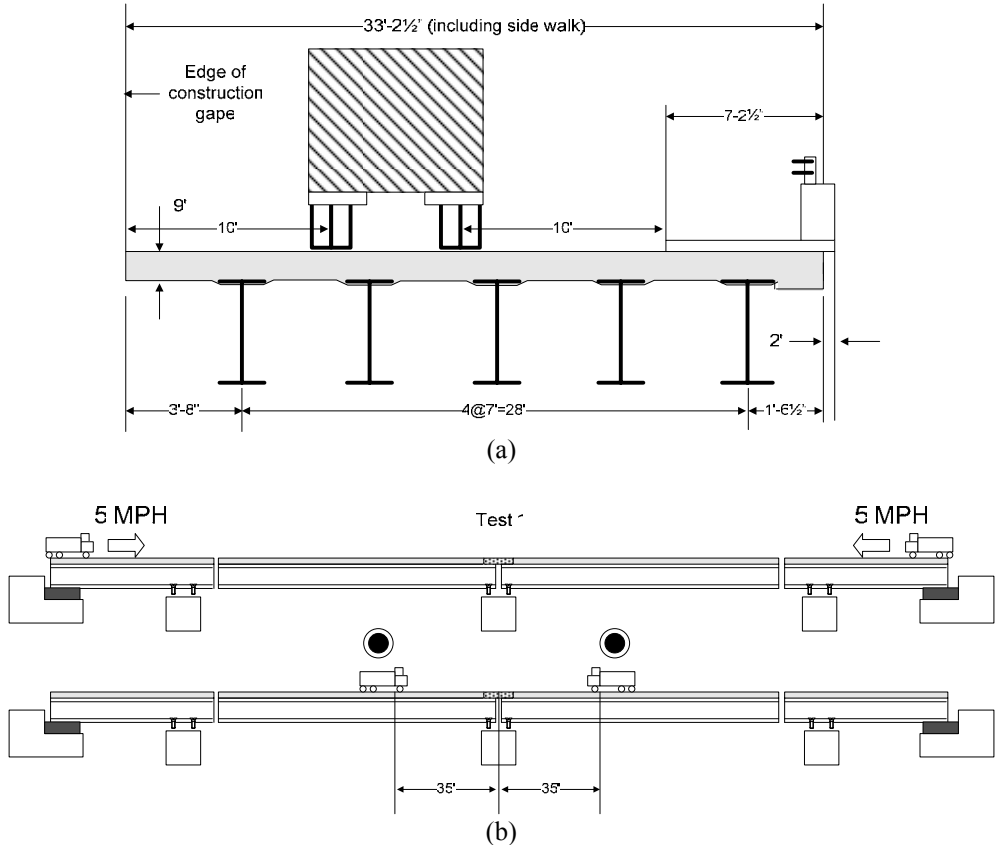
(a) Transverse truck location of Test #1; (b) Load plan for Test #1
